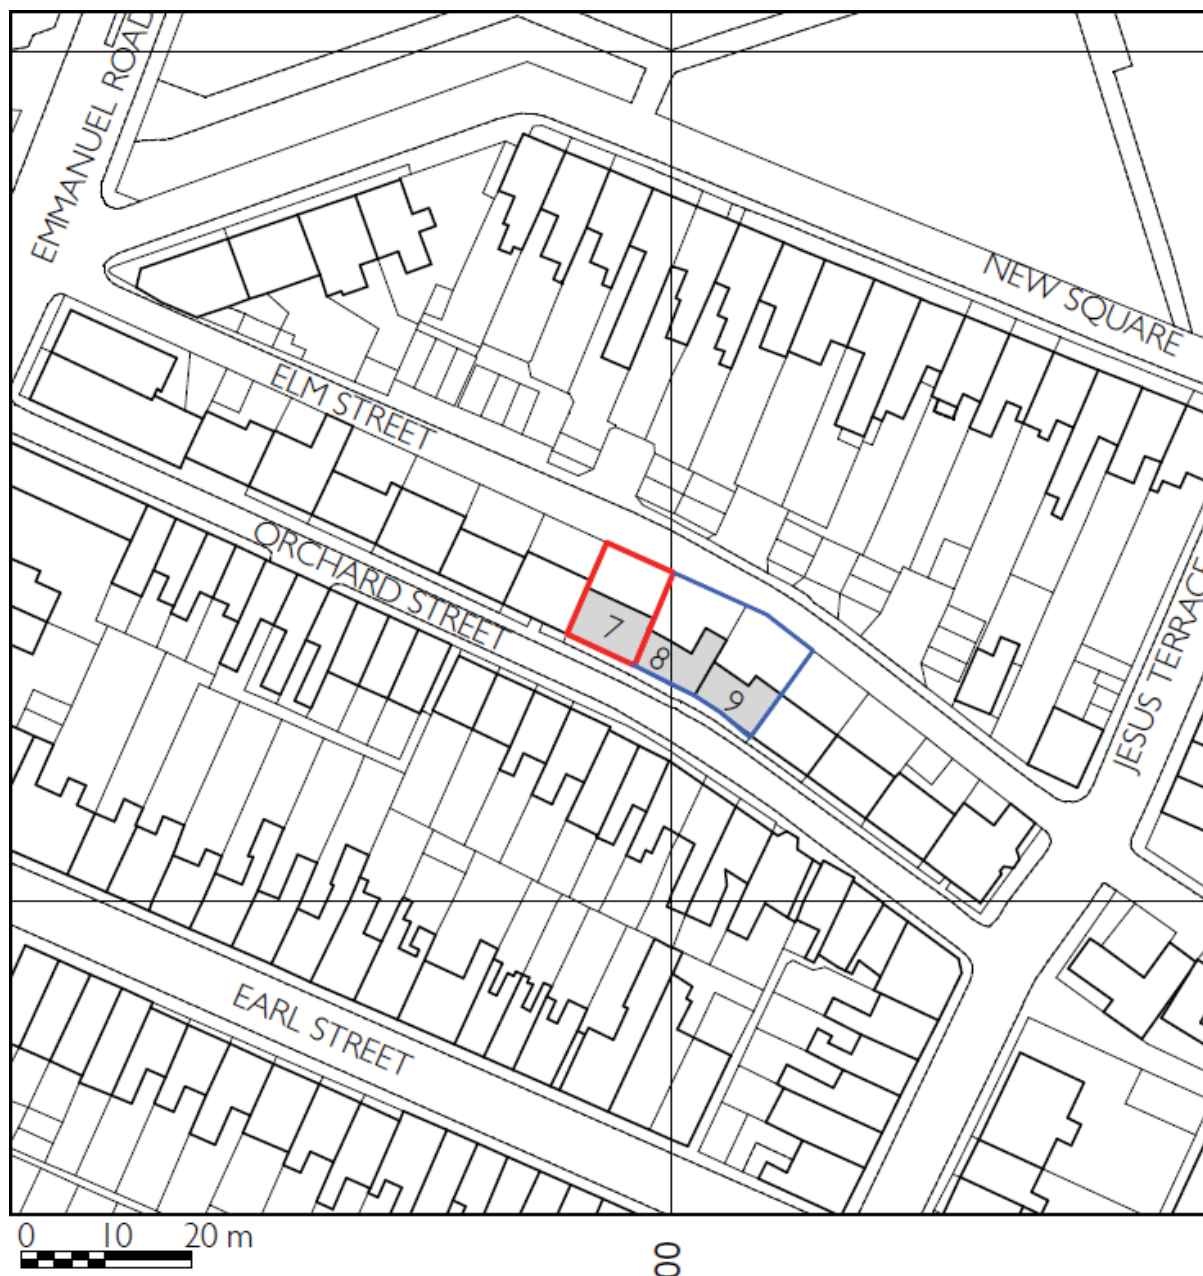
Site Plan of No. 7 Orchard Street (Courtesy of Haysom Ward Miller Architects)
